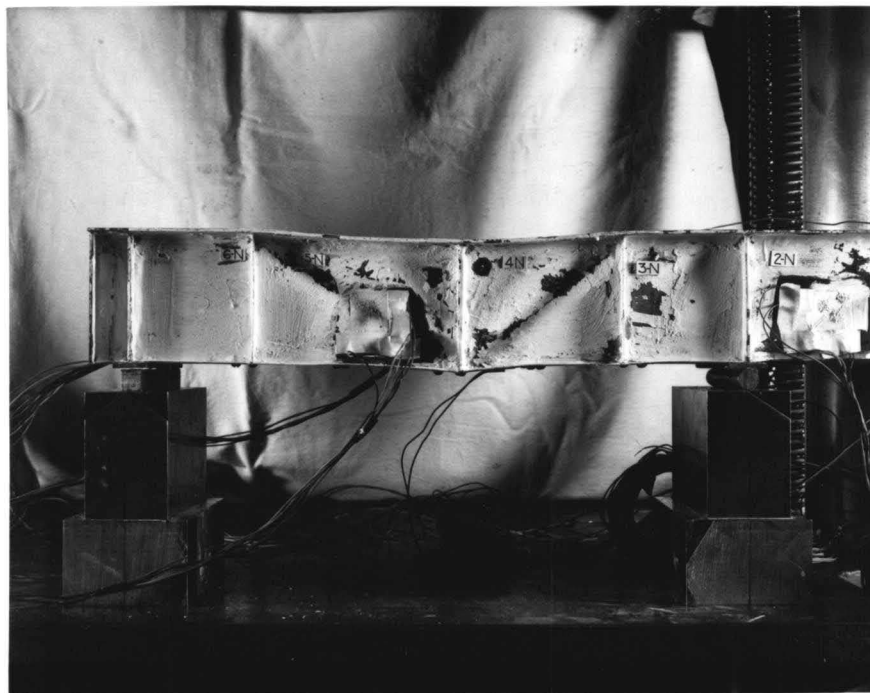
PERMANENT WEB PANEL DEFORMATIONS - SPECIMEN M2
